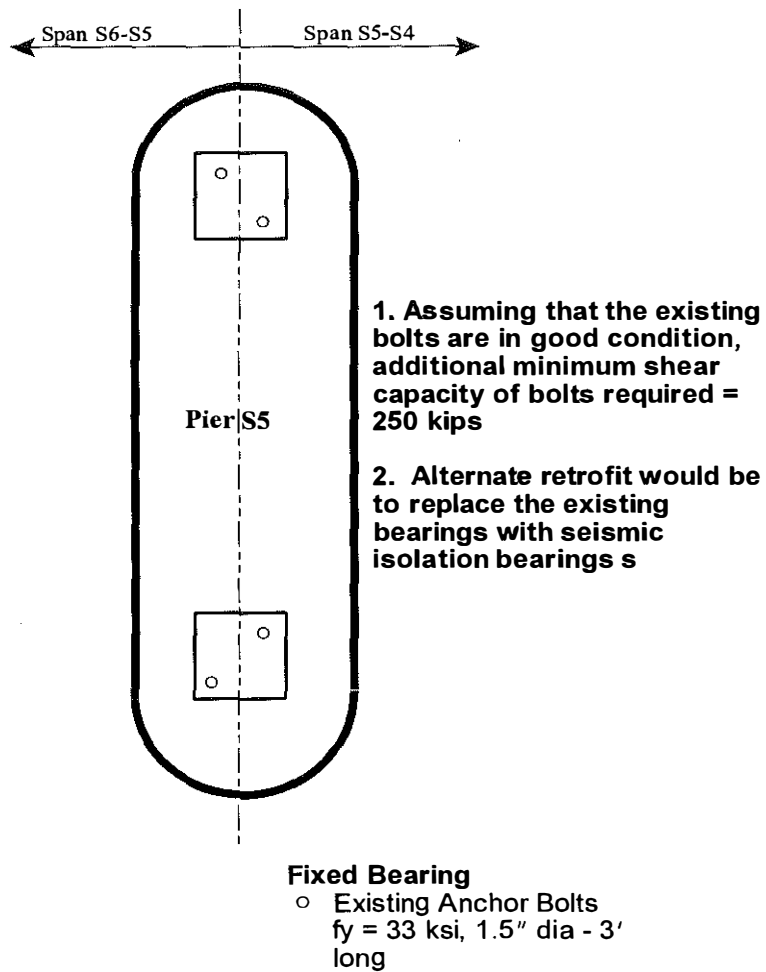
Minimum Required Shear Capacity ( $V_{req}$ ) to be Provided by Additional Anchor Bolts at Bearings of Pier S5 on the Henderson, KY Approach of the US41 Northbound Bridge
